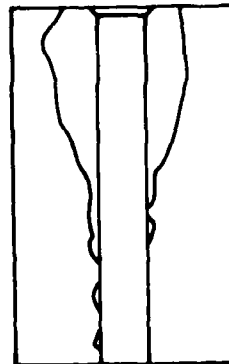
(iii) FRACTURES TYPE (biii) SPECIMENS.
